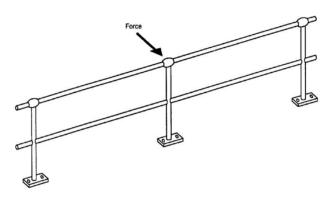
TYPICAL GUARDRAIL POST TEST
